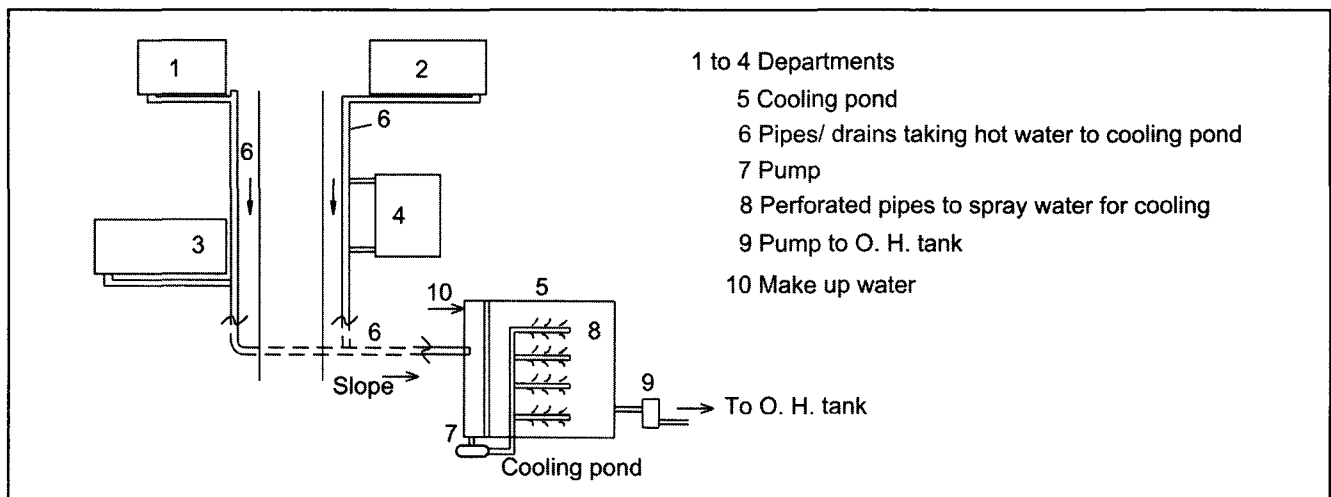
Layout of hot water lines from various departments and cooling pond.
